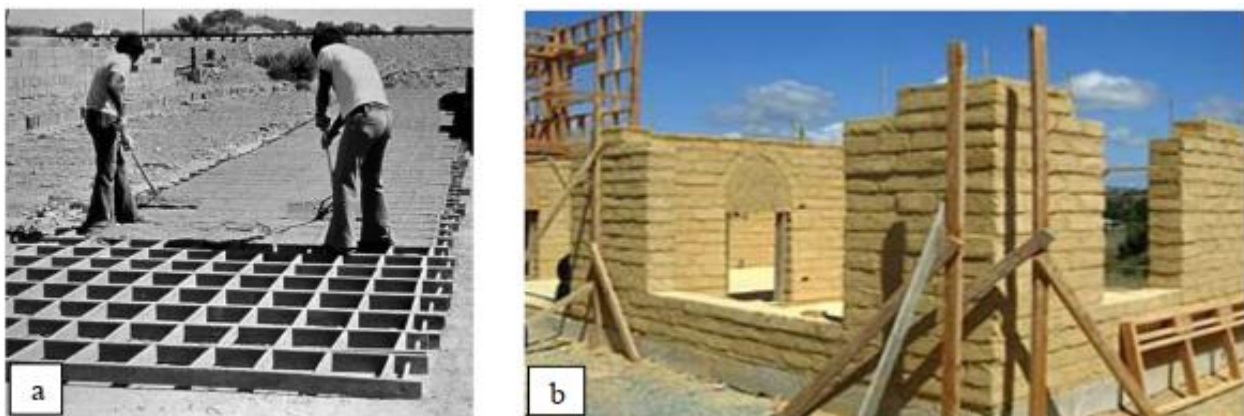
a) Adobe brick manufacturing process; b) Construction of an adobe brick house
